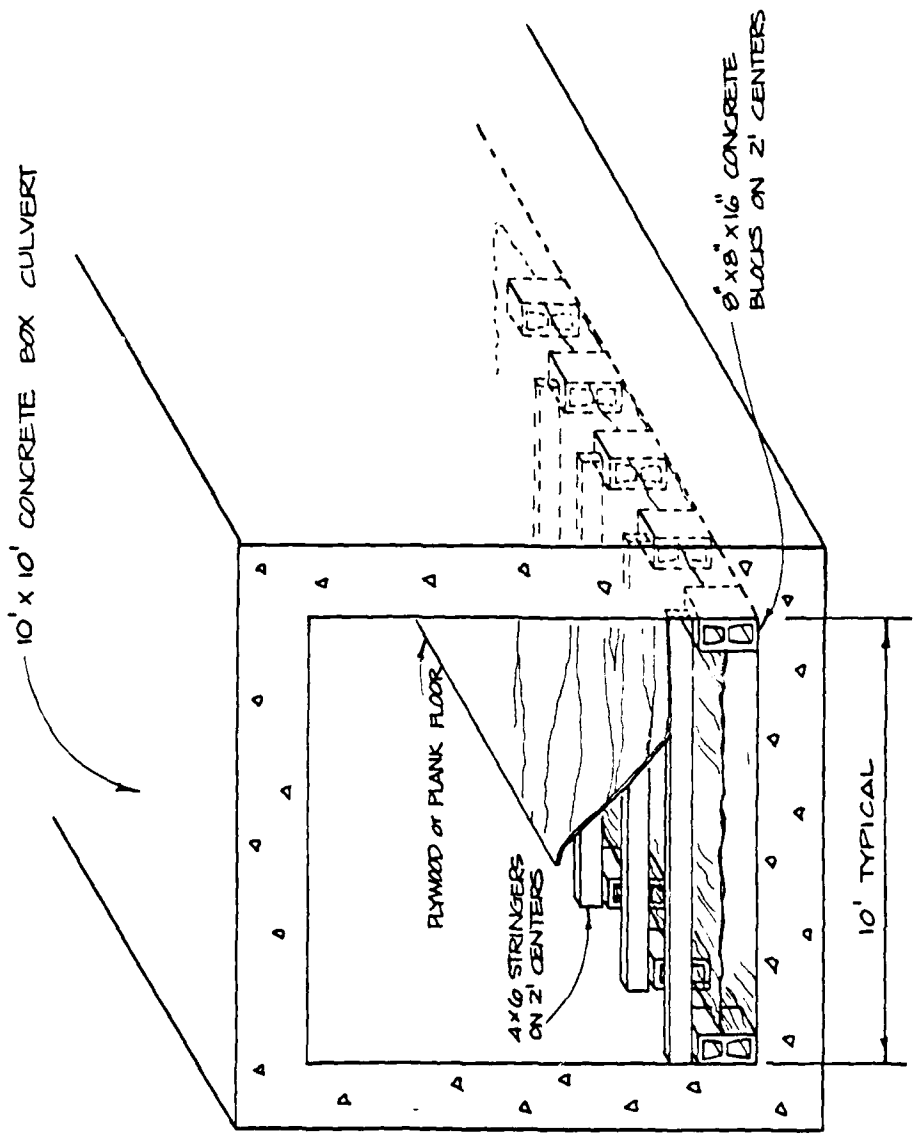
Box Culvert Host Area Shelter With Low-Flow False Floor.
